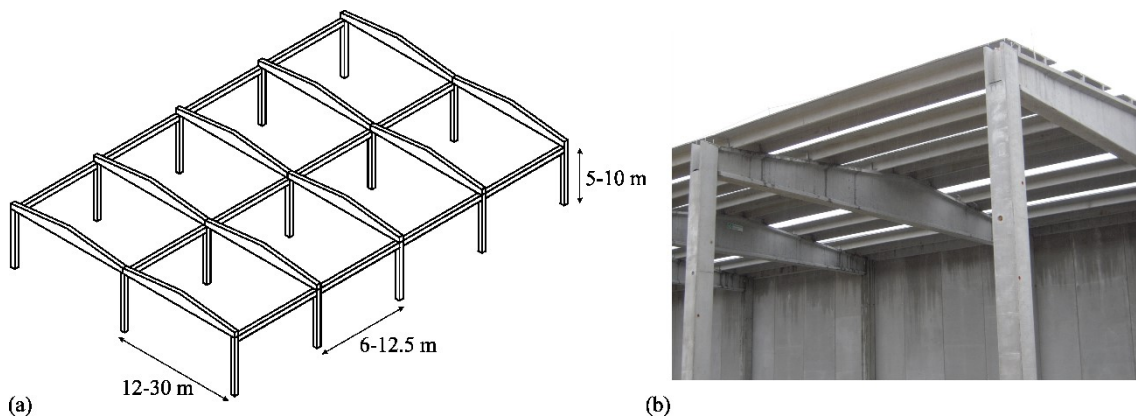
RC precast structure: (a) scheme of the structural system of the one-storey building and (b) the structure under construction
